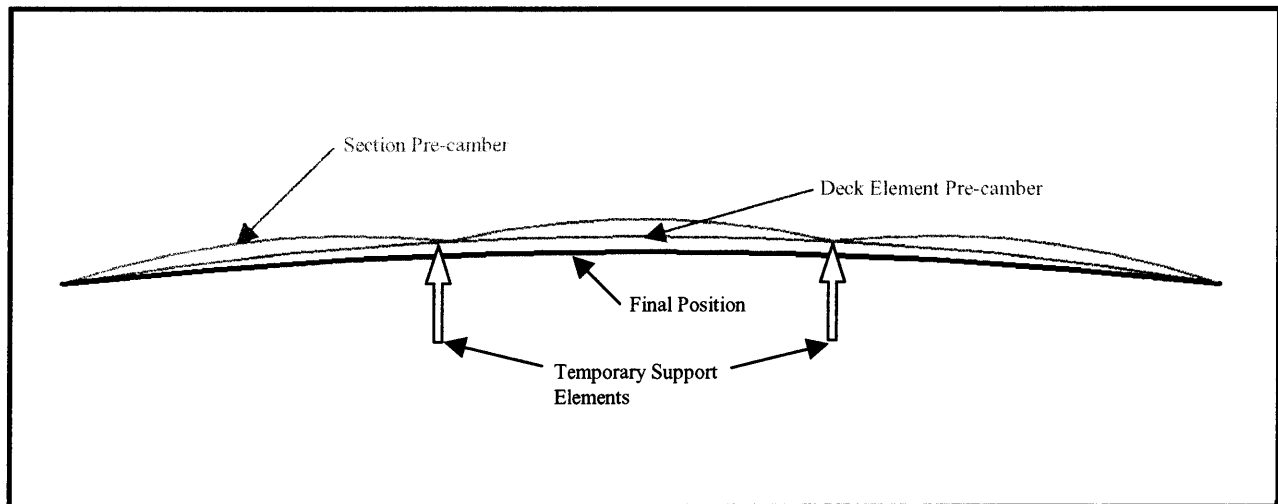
Elevation of bridge deck showing pre-cambers.
